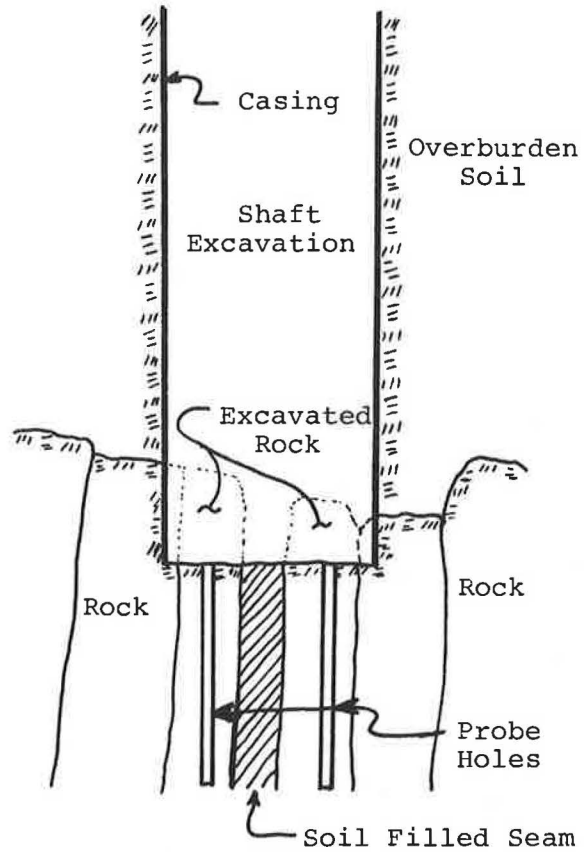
Shaft bearing over vertical soil-filled seam.
